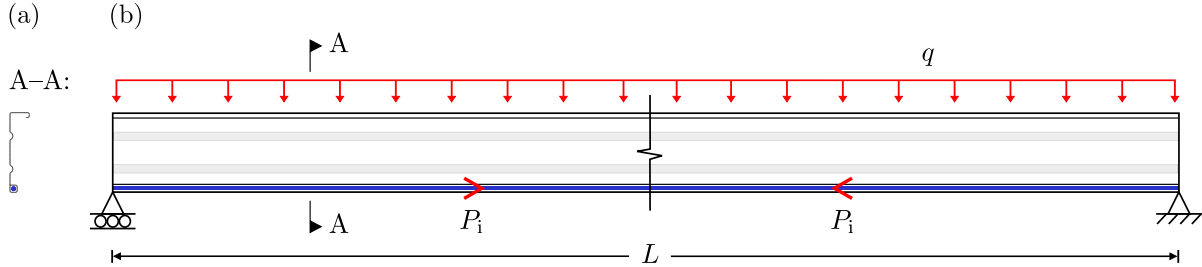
(a) Cross-section profile and (b) loading configuration of the prestressed cold-formed steel beam in the worked example.
